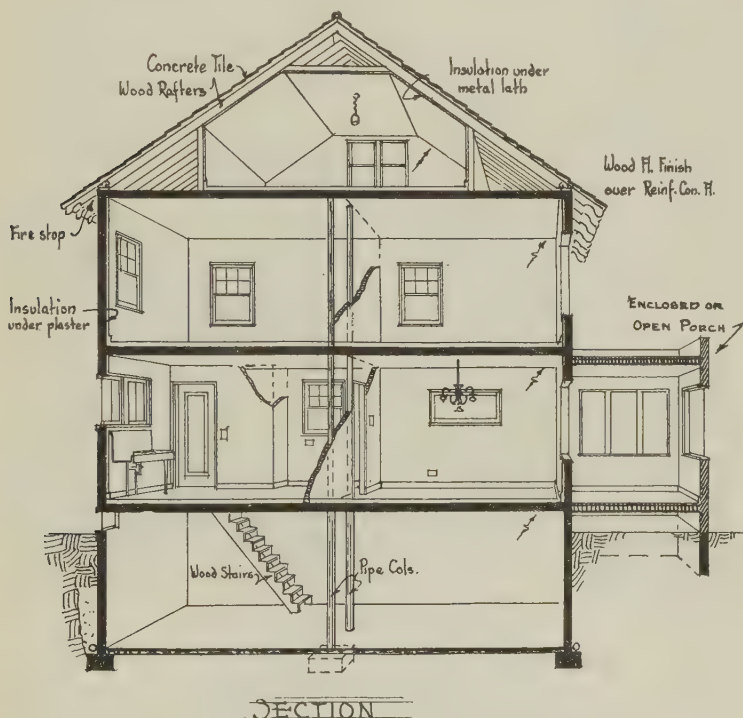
EXPOSED SECTION THROUGH TYPICAL HOUSE.
